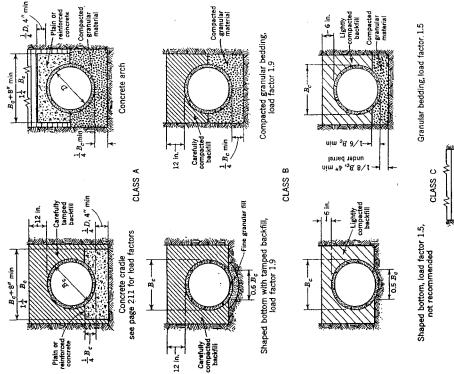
Classes of bedding for conduits in trench. Note: In rock trench, excavate at least 6 in. (15 cm) below the bell of the pipe except where concrete cradle is used.
